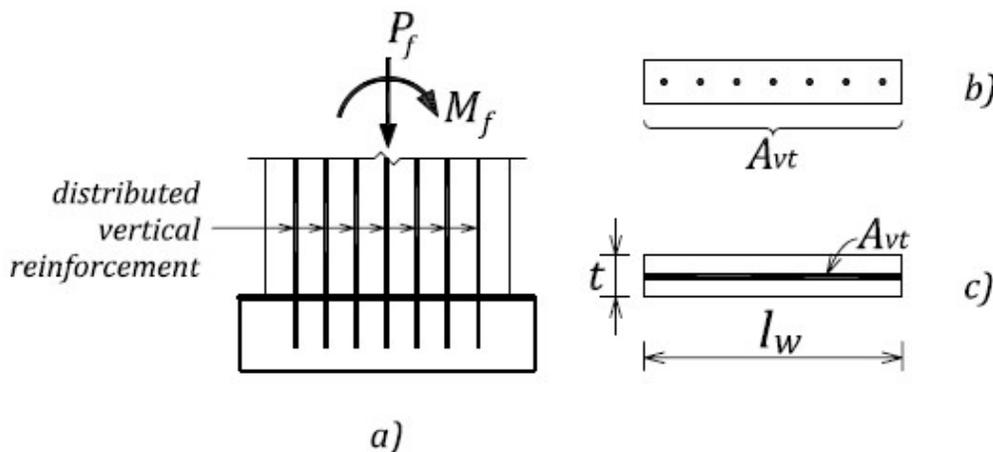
Shear wall with distributed vertical reinforcement: a) vertical elevation; b) actual cross section; c) equivalent cross-section.
